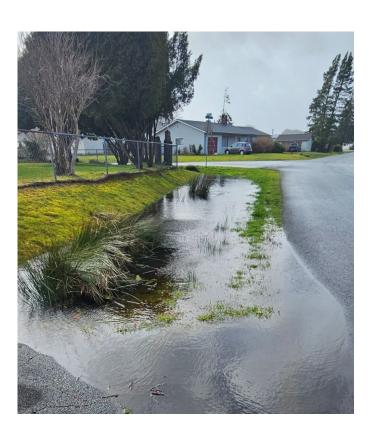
Roadside ditch along Redwing Way and Ortelius Drive
